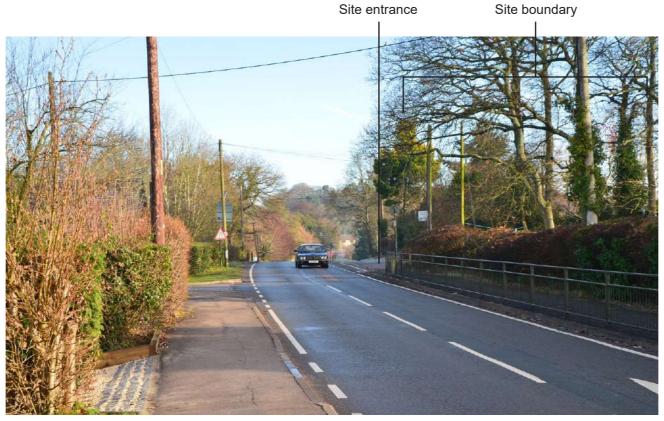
View south-west towards the site opposite The Greatham Inn on Petersfield Road.
